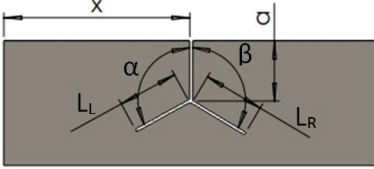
A zoom on a steel beam having a Y-shaped crack
